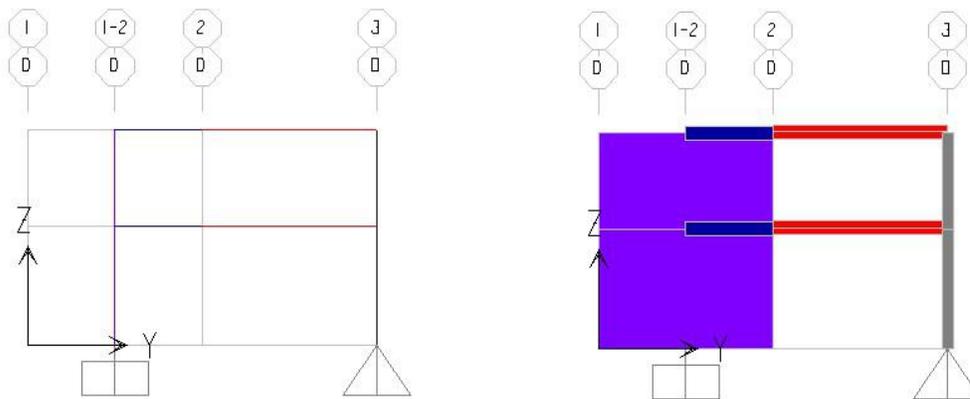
A 2-D numerical model of the retrofitted building (RS3): Frame D (RC shear wall shown in purple color).
